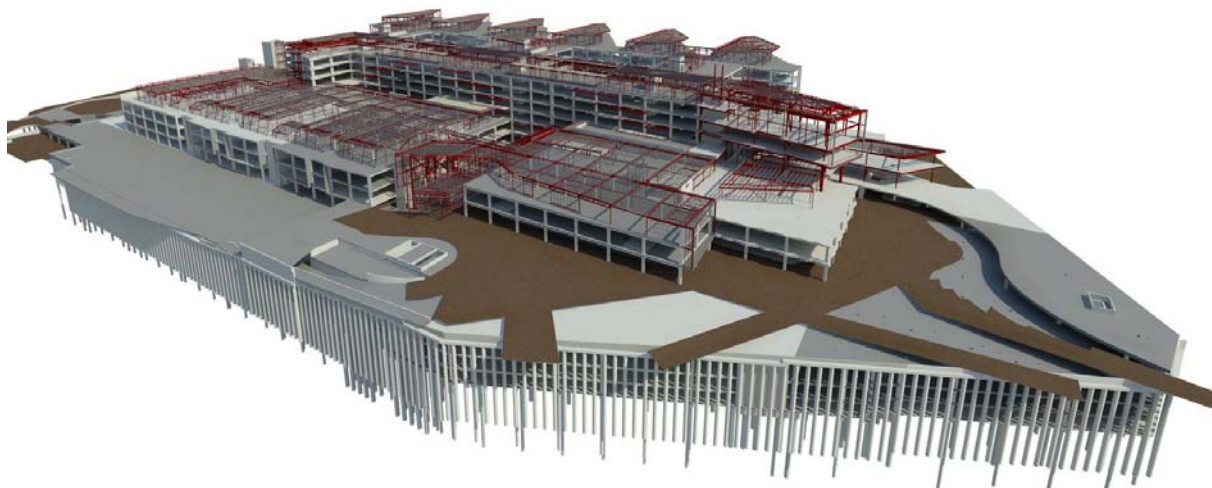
3D Structural Model showing 3 Storey underground carparking and basement retention system
